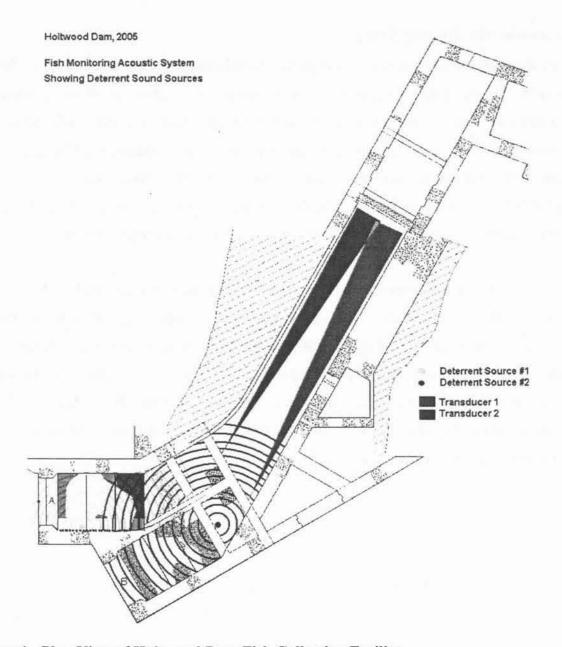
Plan View of Holtwood Dam Fish Collection Facility
